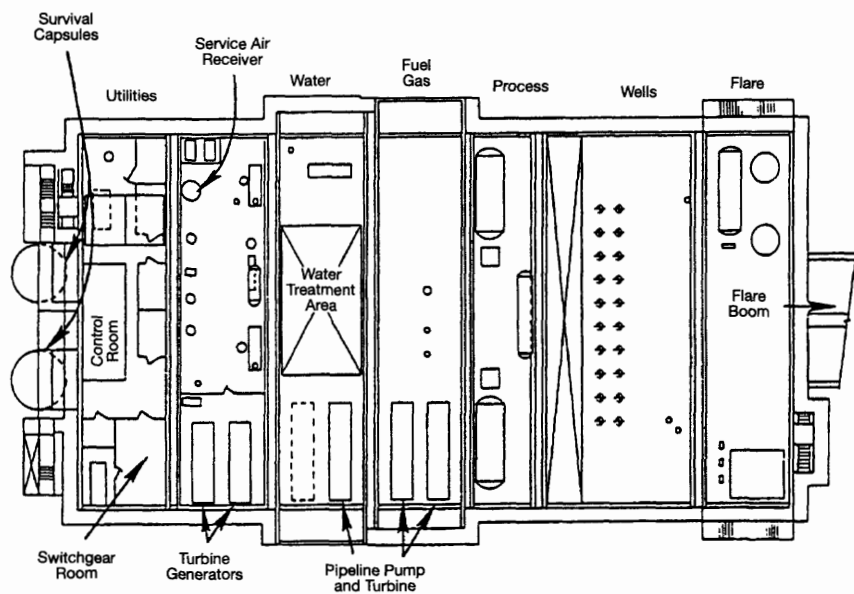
Equipment arrangement plan of a typical offshore platform illustrating the layout of the lower deck.
